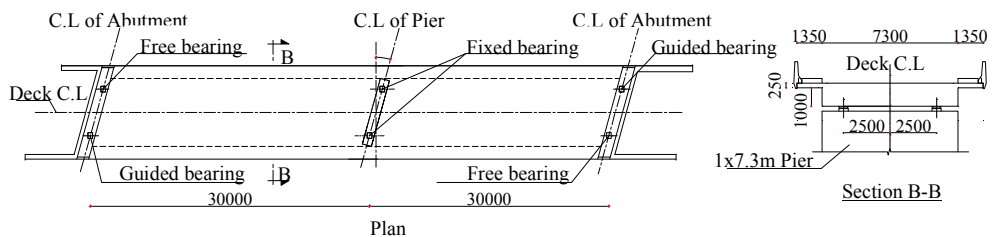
Plan and cross section of two 30m span skew bridge used in the present study
